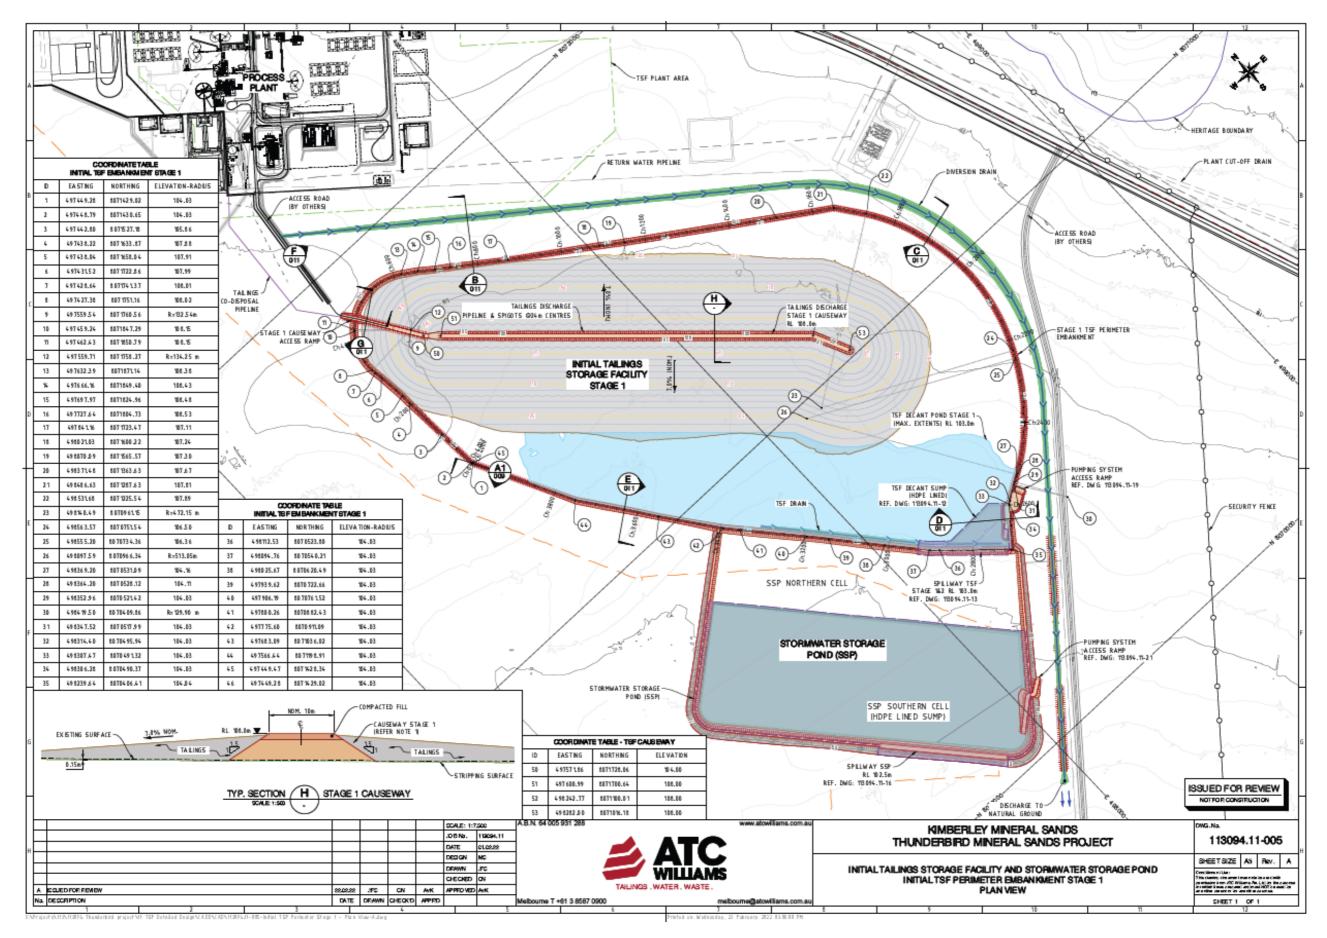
Drawing – Initial TSF and SPP, TSF perimeter embankment stage 1 plan view
